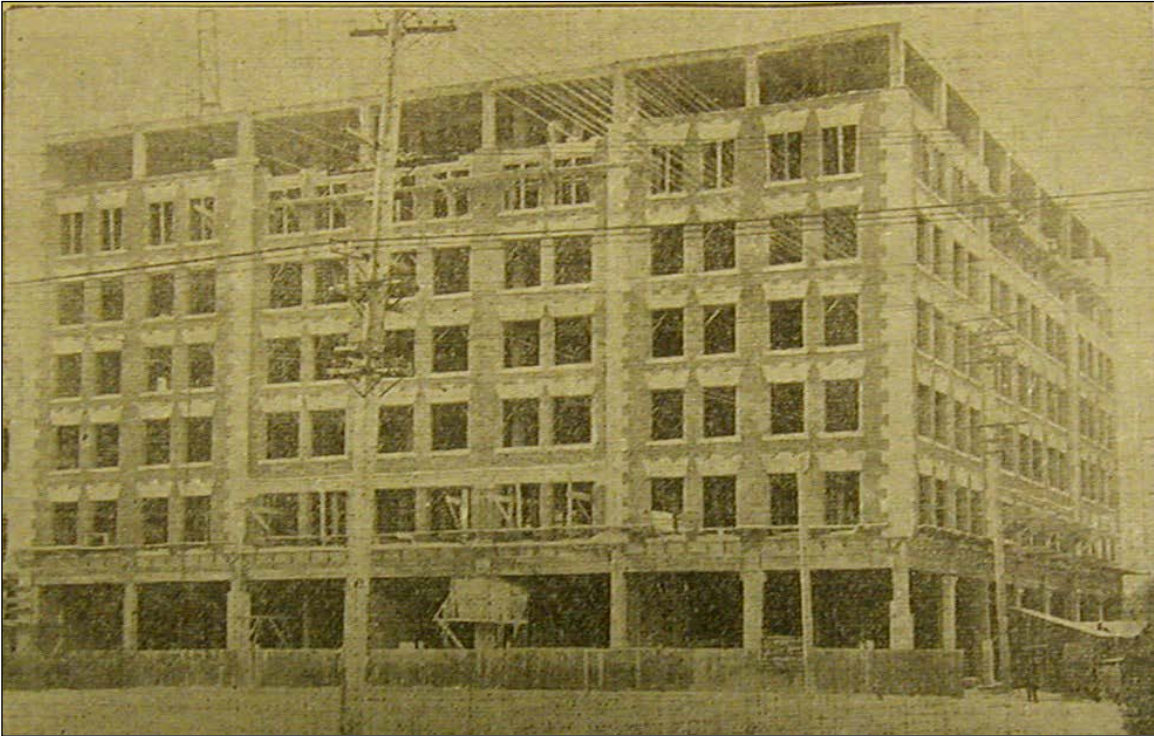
Somerset Building, 294 Portage Avenue, during construction in 1906. (Reproduced from Manitoba Free Press, December 6, 1906, p. 38.)
